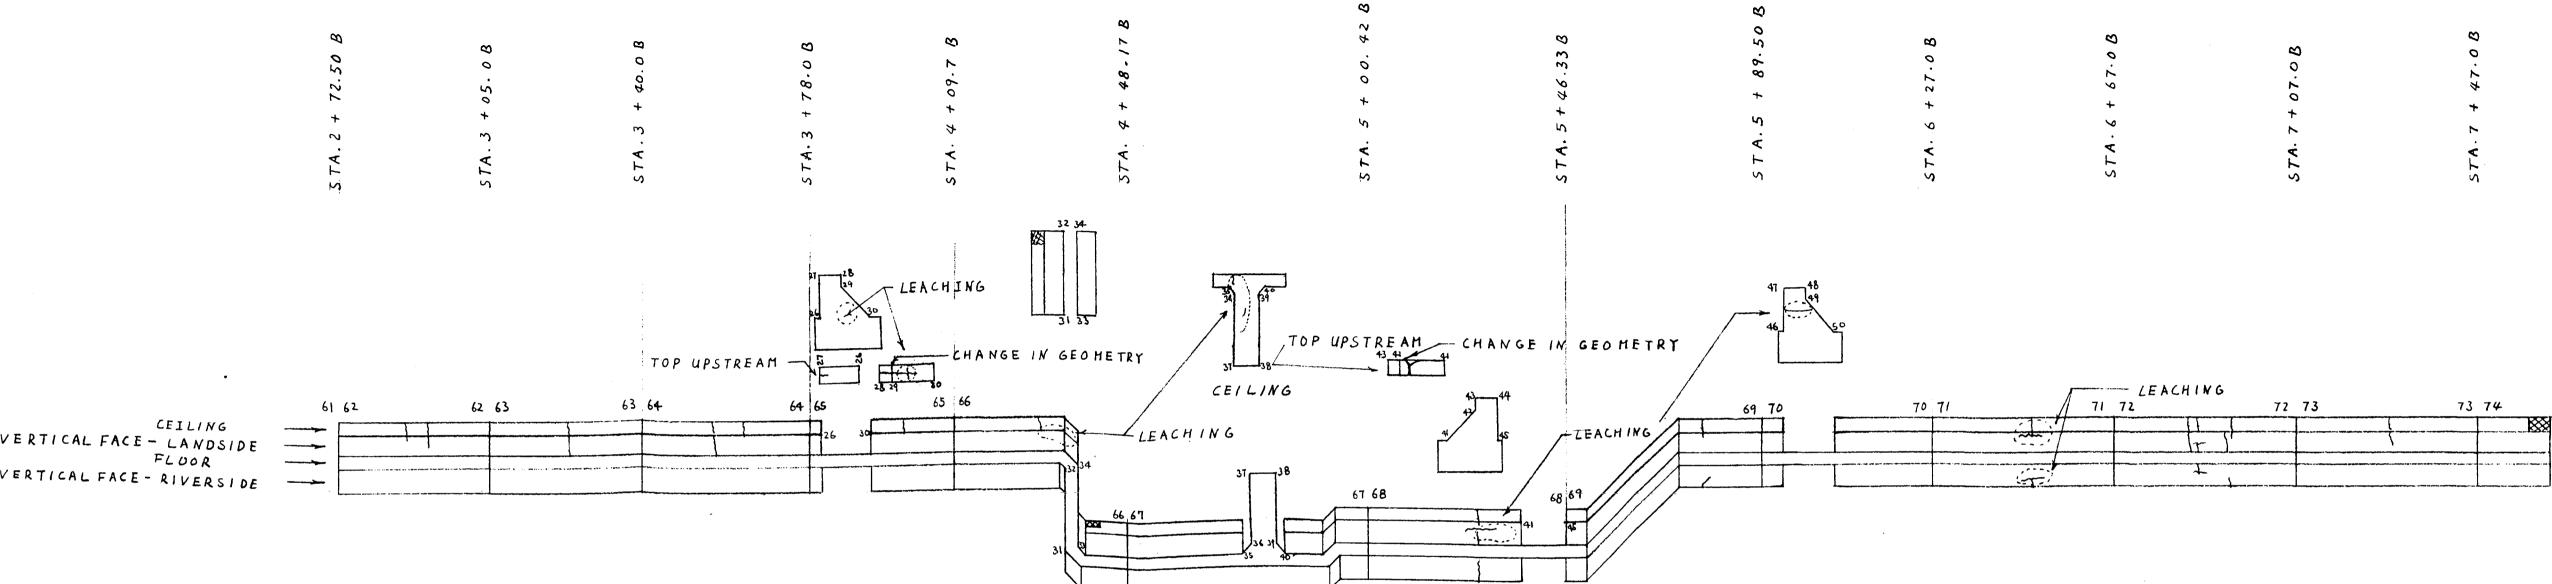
Surface cracking, pipe gallery, land wall, and lower end
